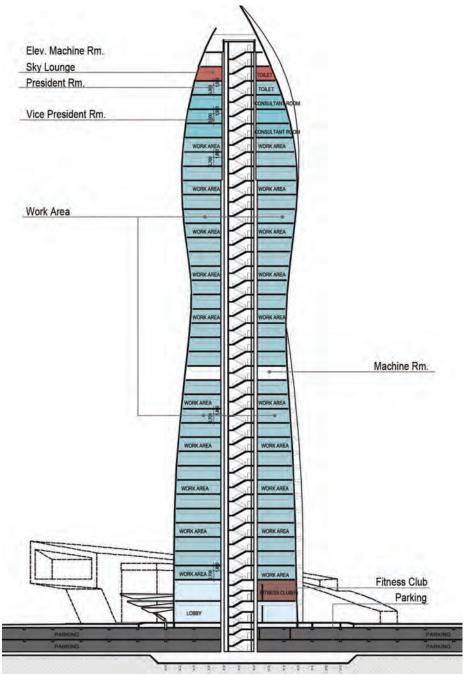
Tower zoning planning (Source: Heerim Architects & Planners) 图3. 大厦分区规划(来源: Heerim Architects & Planners)
